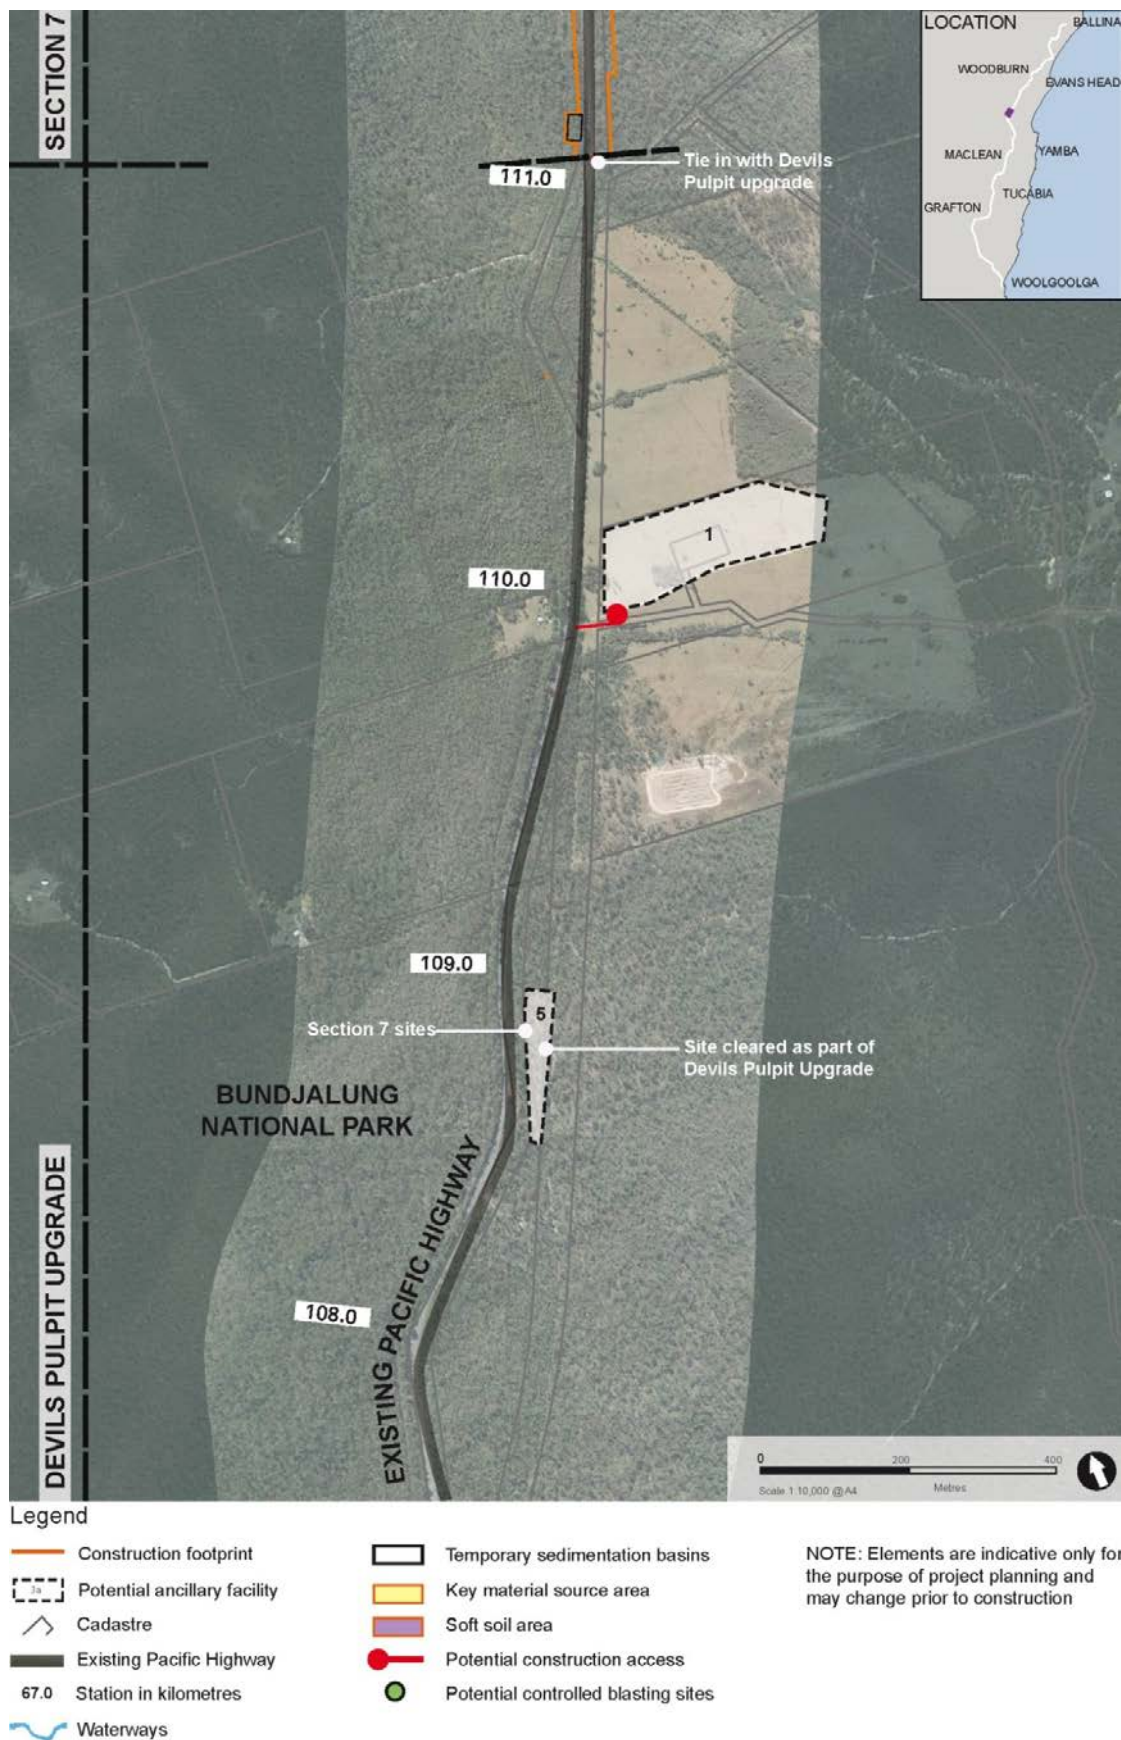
Extent of construction and construction features Section 6 (Station 107.6 to 111.4)
